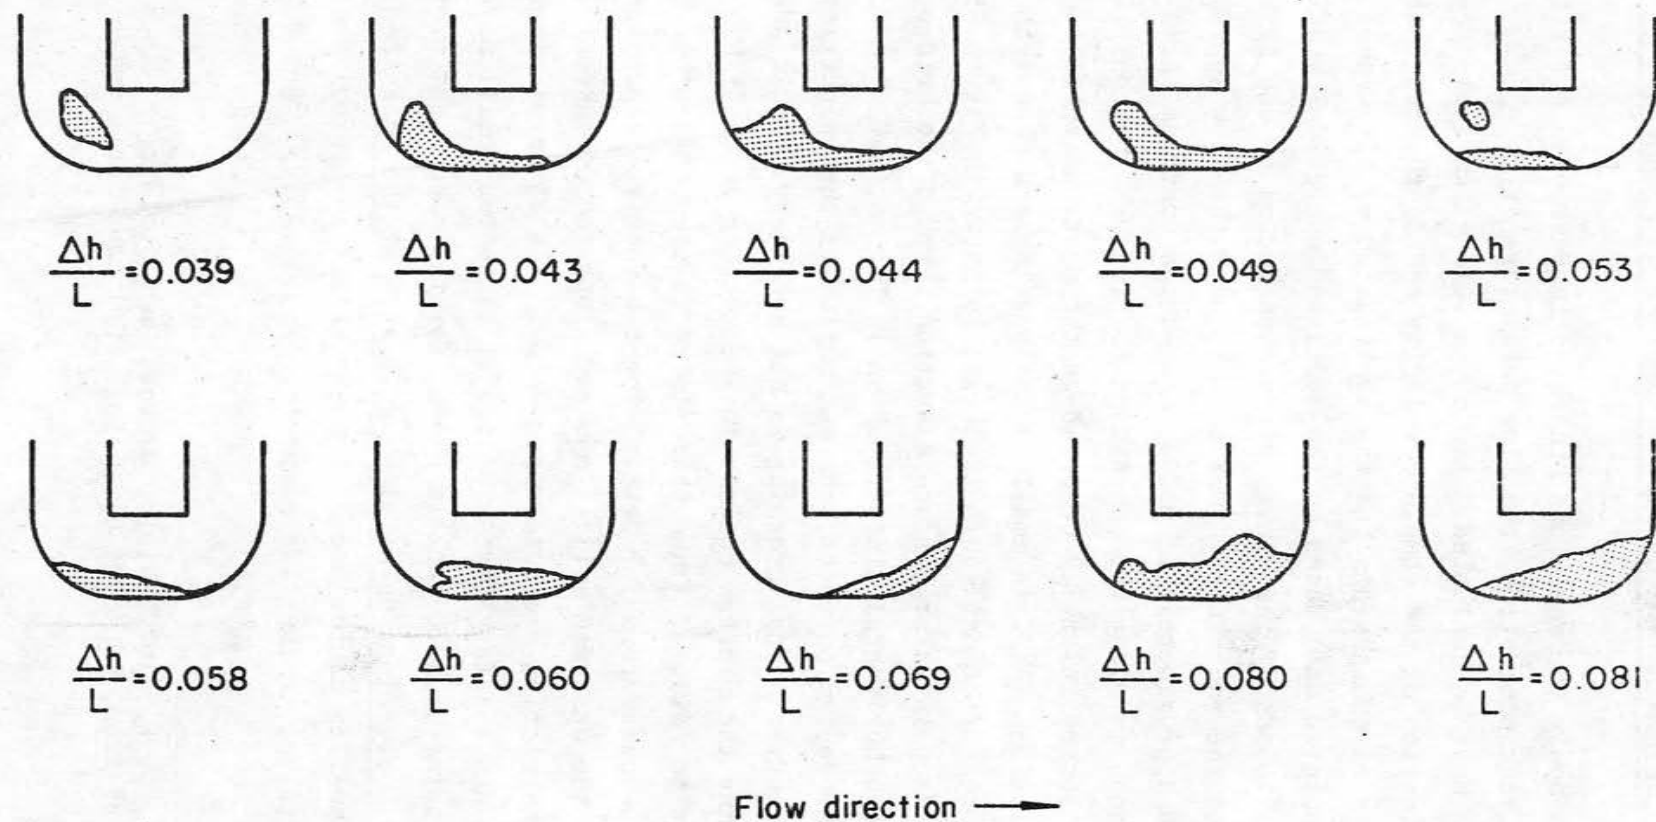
A8.1 Zones of failure on riprapped embankments.
